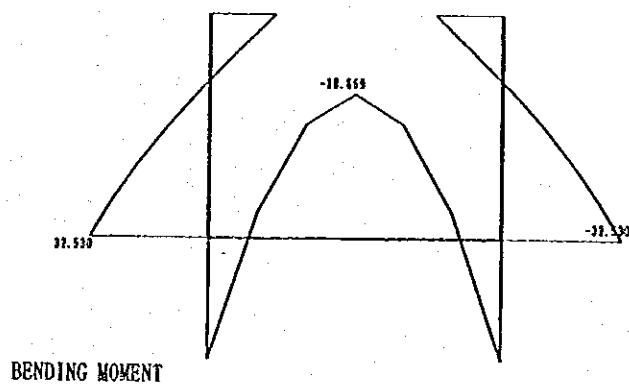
Sectional Forces of Tailrace : S-2 in Flood Condition
